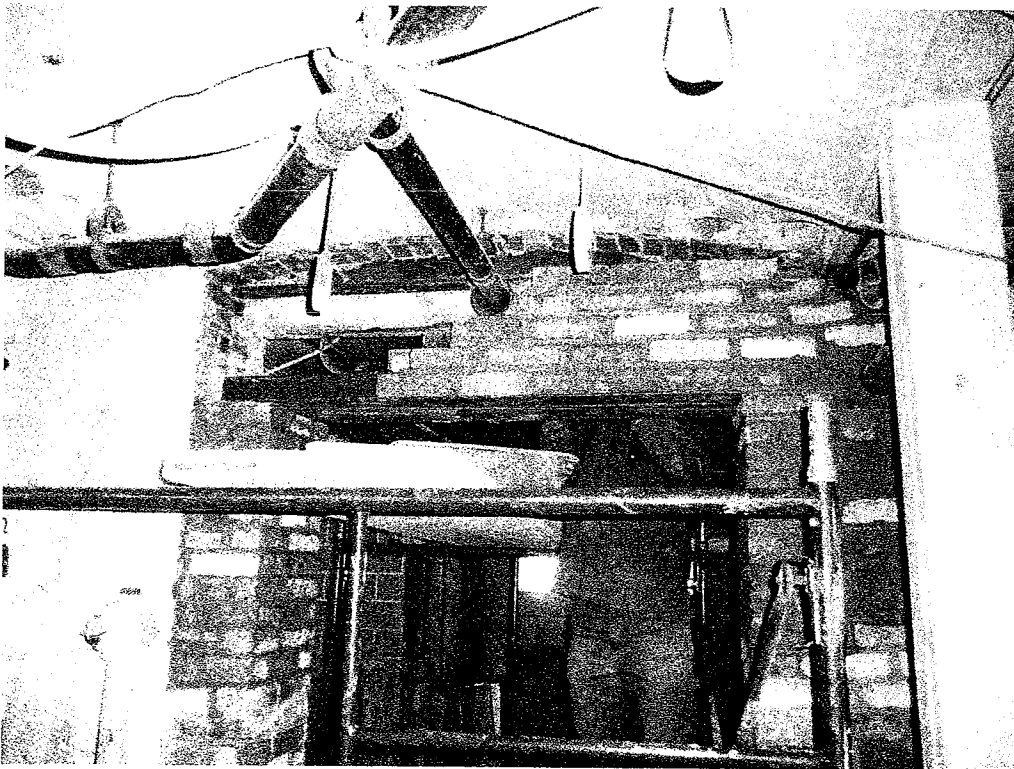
New lintel at grid 2.3/G.7 in basement.
